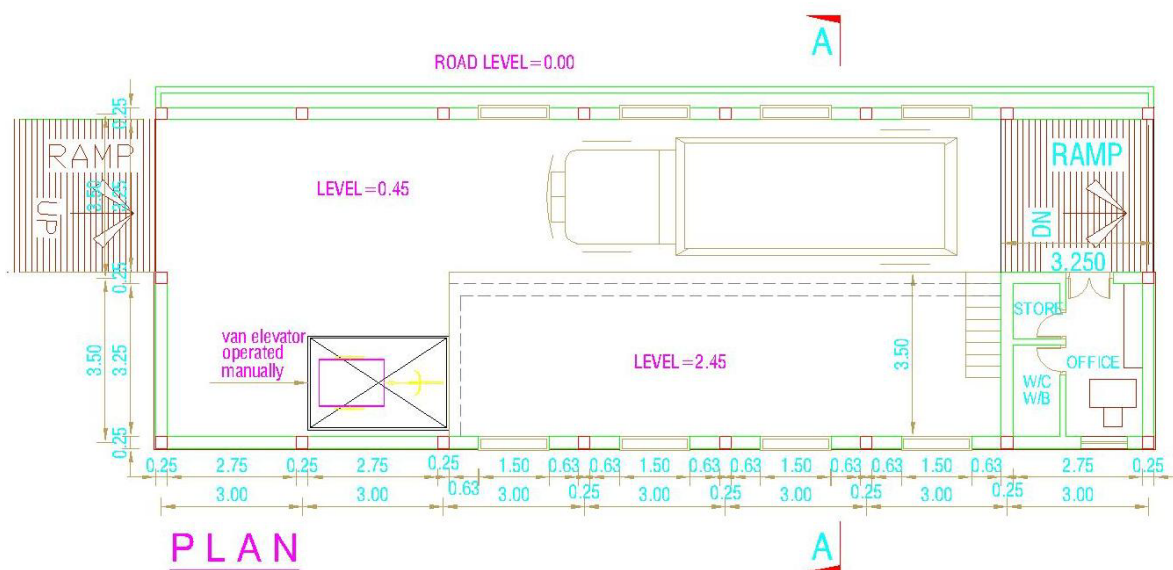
STS – 1 Uttara Jasimuddin Road Preliminary Plan
